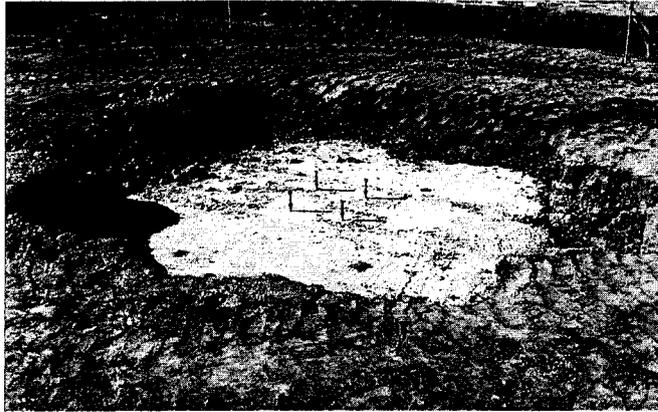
A completed spread footing. The four bolts extending out of the footing will be connected to the base plate of a steel column.
